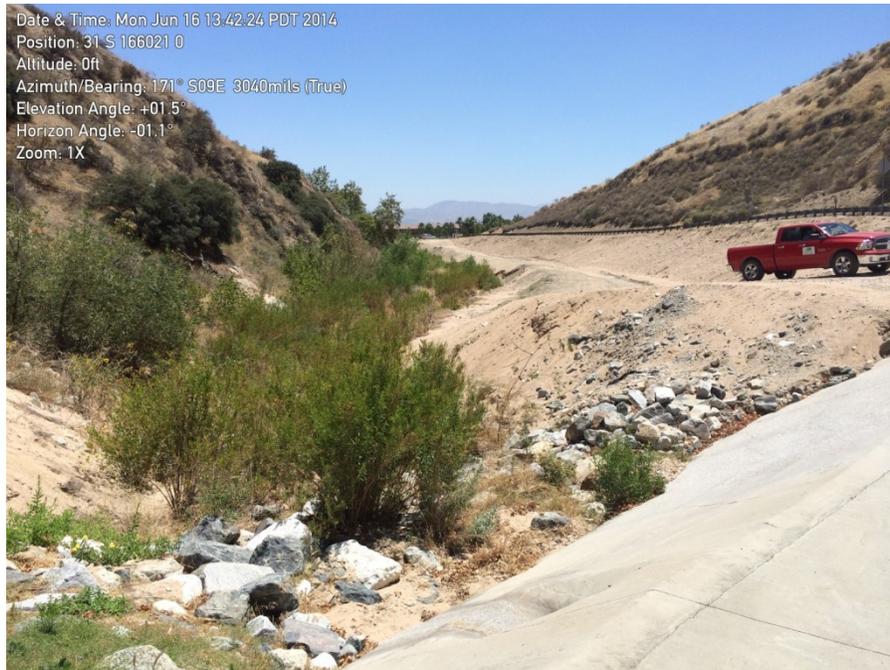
Looking south from north end of BSA. Photo taken: 6/16/2014.
